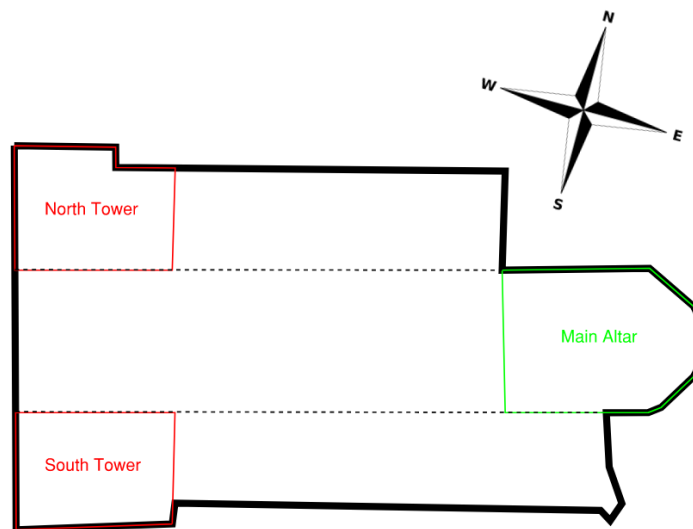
Floor plan of the church with the north and south towers indicated in red, and the main altar indicated in green. Dashed lines through the church floor plan indicate the separation of the naves.
